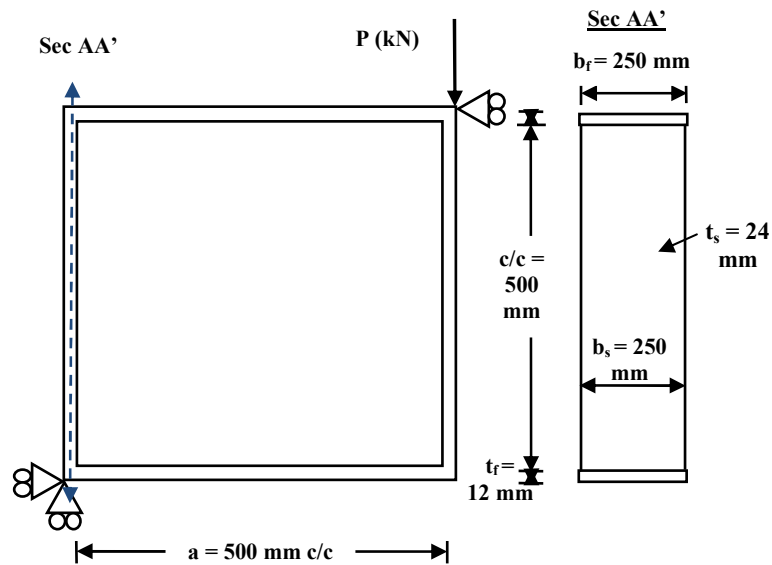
Dimensions, loading and boundary conditions of steel frame
